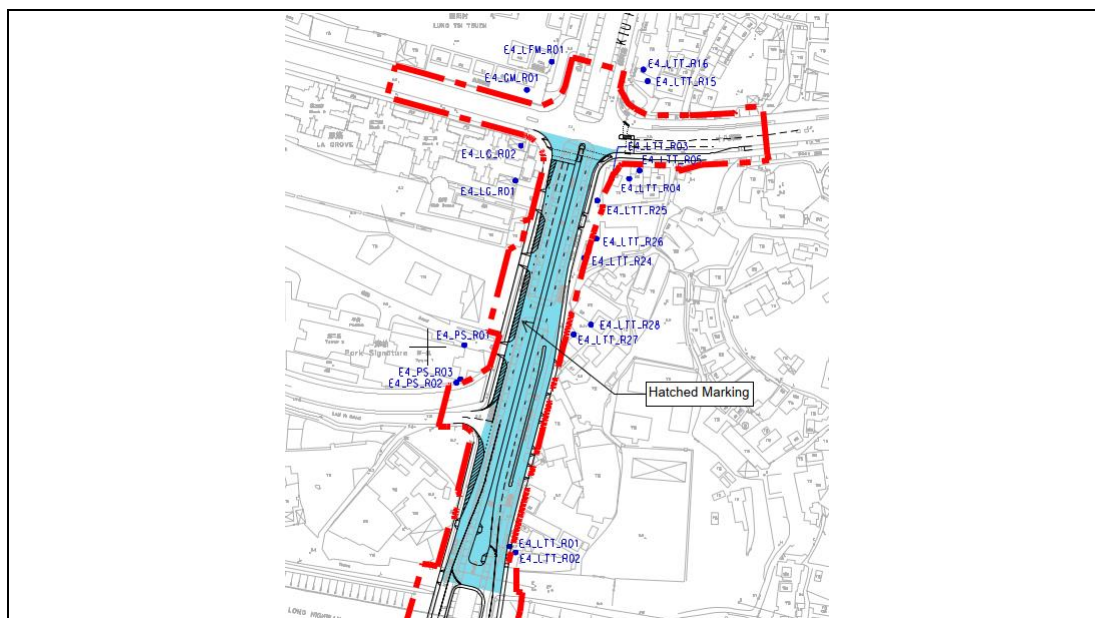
Location of Hatched Road Marking on Kung Um Road
